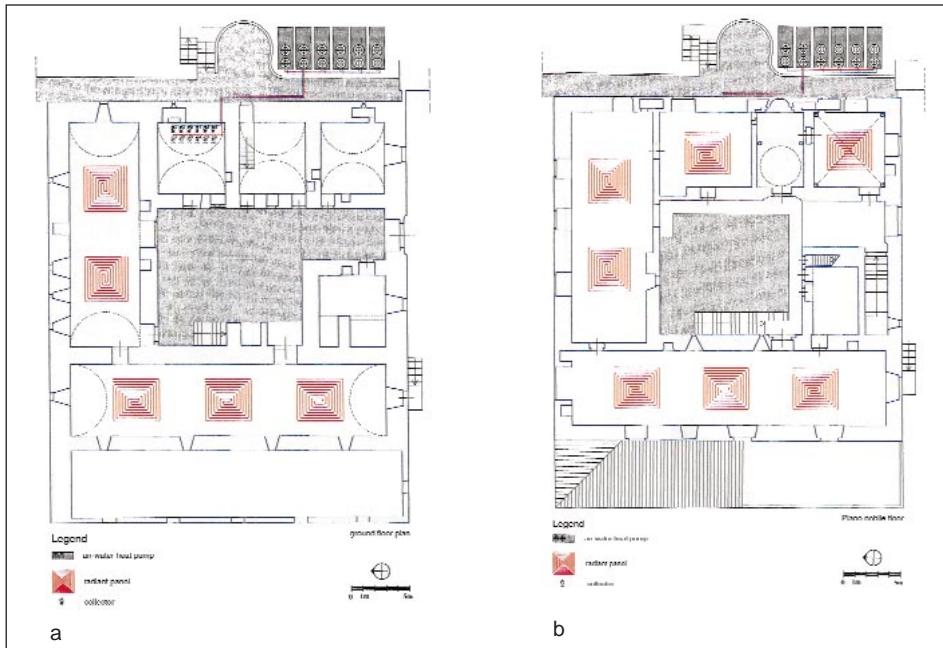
Proposal for the installation of radiant floor heating in the Castle of Chiaramonte: ground floor plan (a), piano nobile floor (b).
